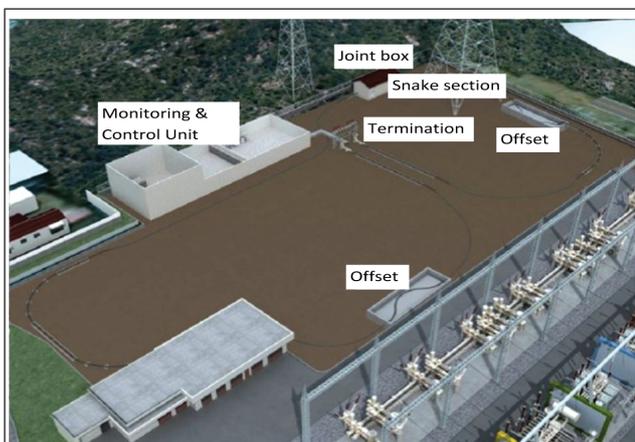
LAYOUT OF CABLE ROUTE AND MONITORING / CONTROL BUILDING FOR CRYOGENIC COOLING SYSTEM
